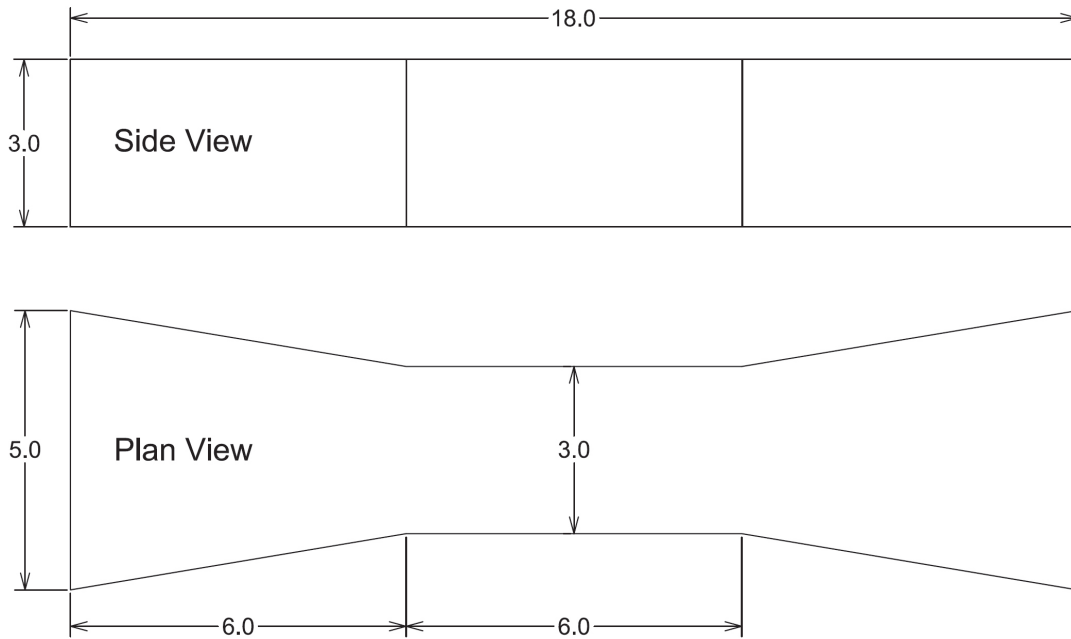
Large dogbone specimen geometry for tensile testing of COR-TUF
